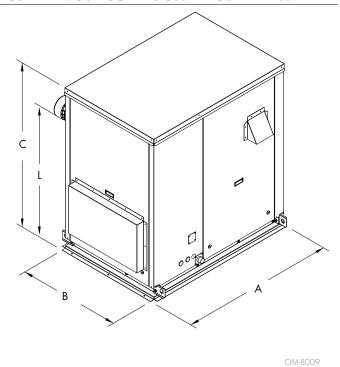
GTS OUTDOOR ENCLOSURE STEAM OUTLET OPTIONS
